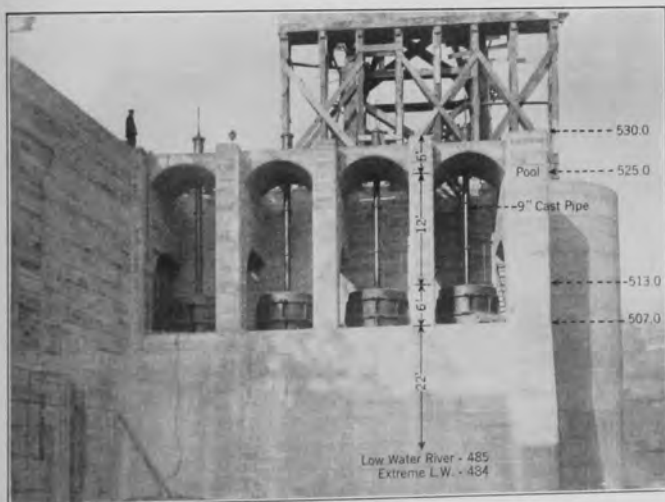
KEOKUK LOCK: INLET VALVES IN PLACE.
